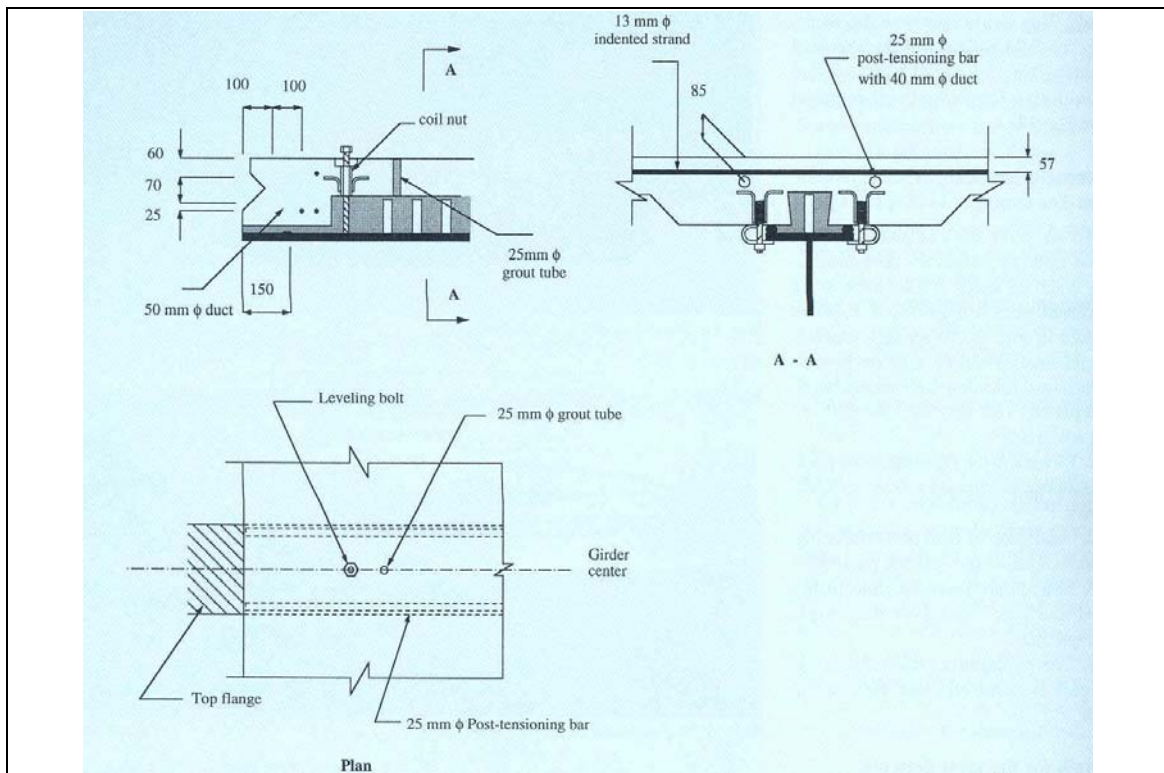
Modified connection details at girder location (Yamane et al., 1998)
